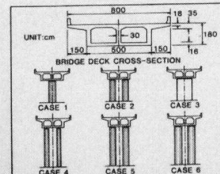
CROSS-SECTIONS OF EXAMPLE FOUR-SPAN BOX-GIRDER BRIDGES
